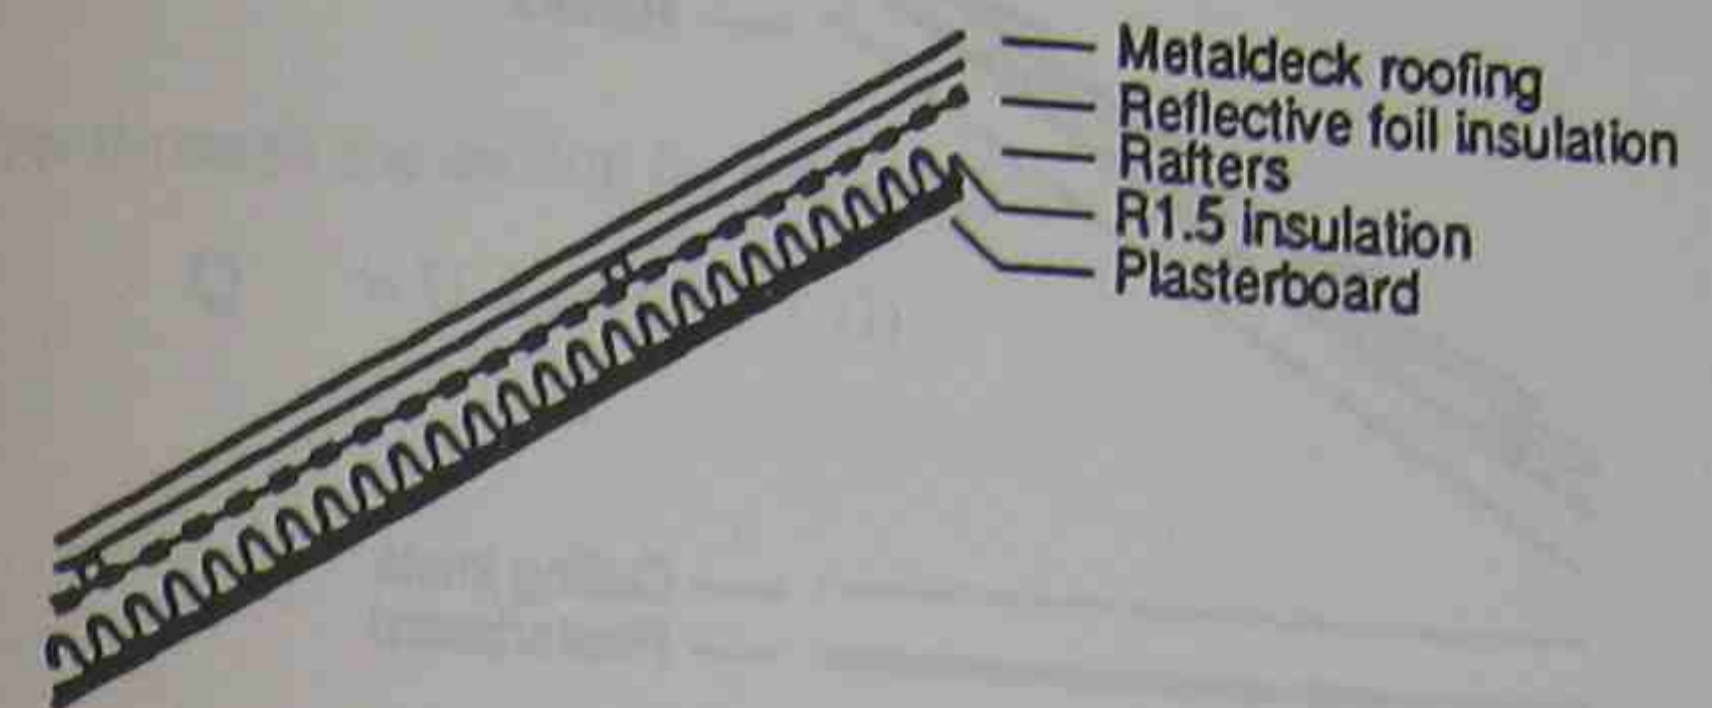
Metaldeck roof with reflective foil insulation and raked ceiling with R1.5 insulation.
